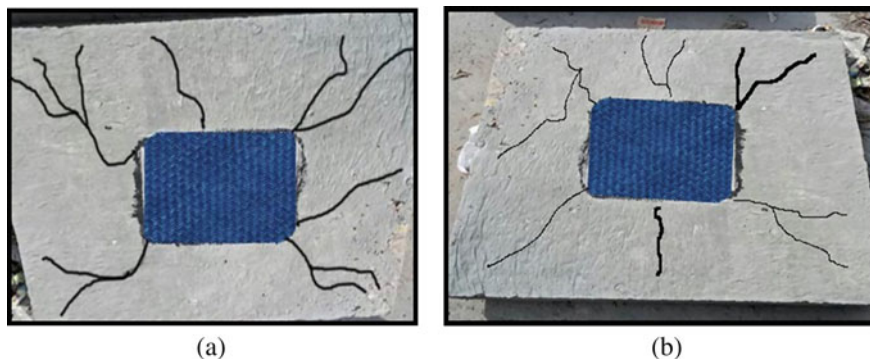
a Crack patterns for square wrapped slab specimen 1 and b crack patterns for square wrapped slab specimen 2
